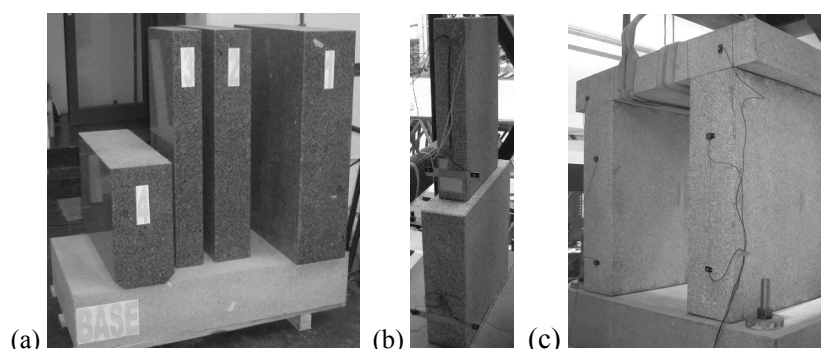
Test specimens; (a) Single blocks, (b) Bi-block structure, (c) Dolmen.
